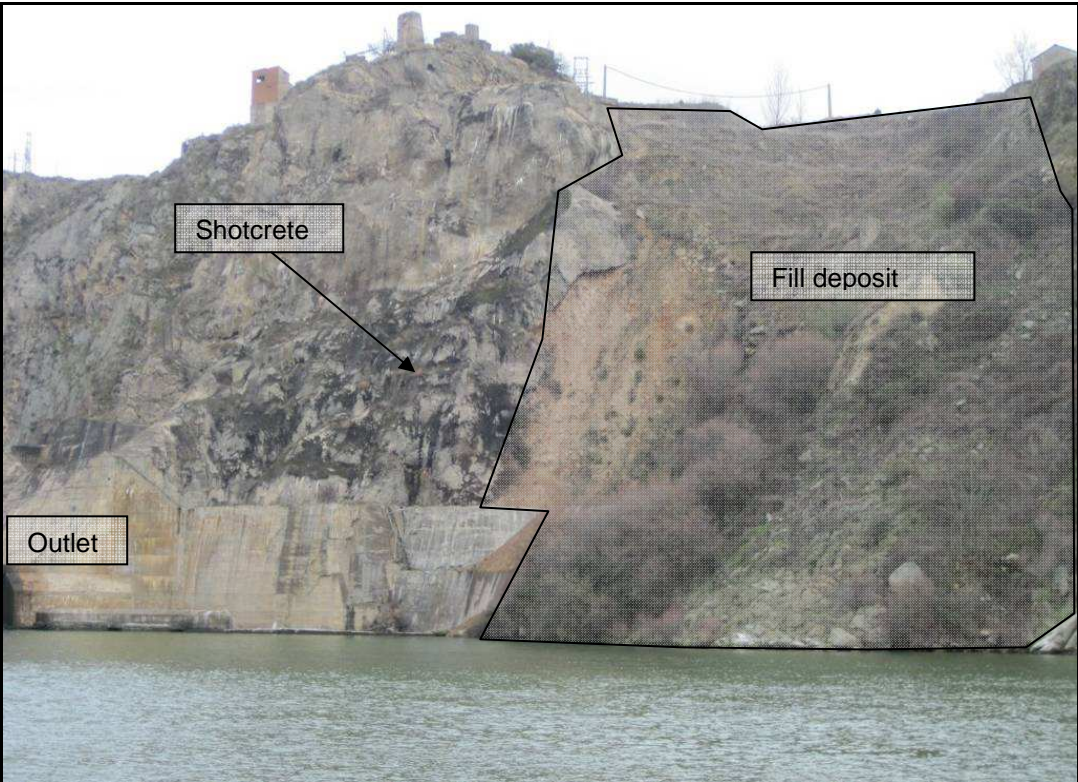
14: View to the fill deposit right at the end of the outlet of the plunge pool. Some raveling occurred where the shotcrete failed.
